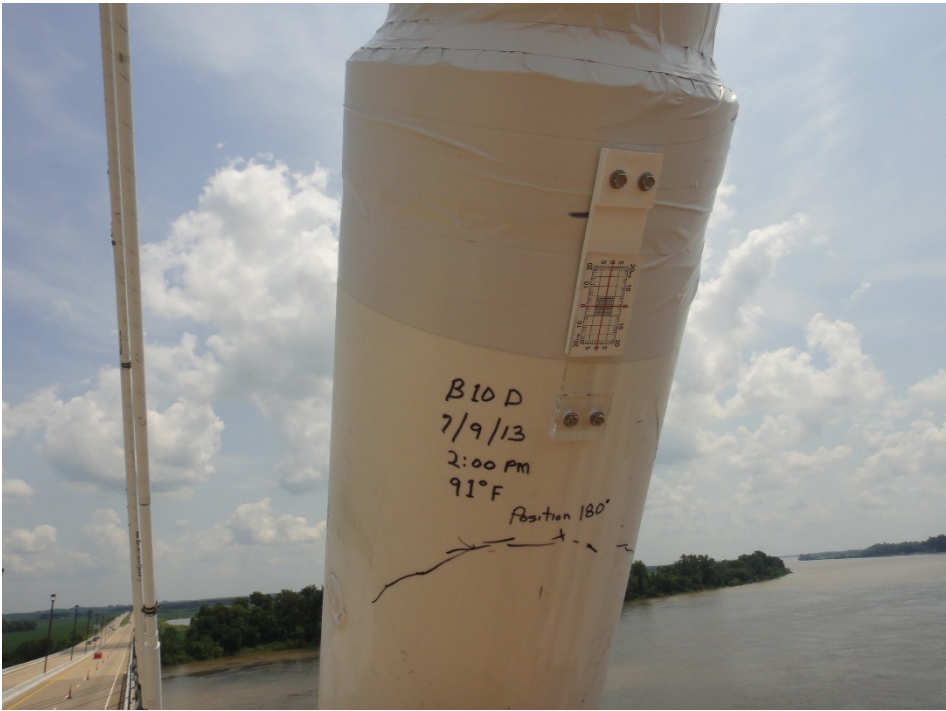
Crack Width Gage Installed at Butt-Weld Crack at a Reducer.
